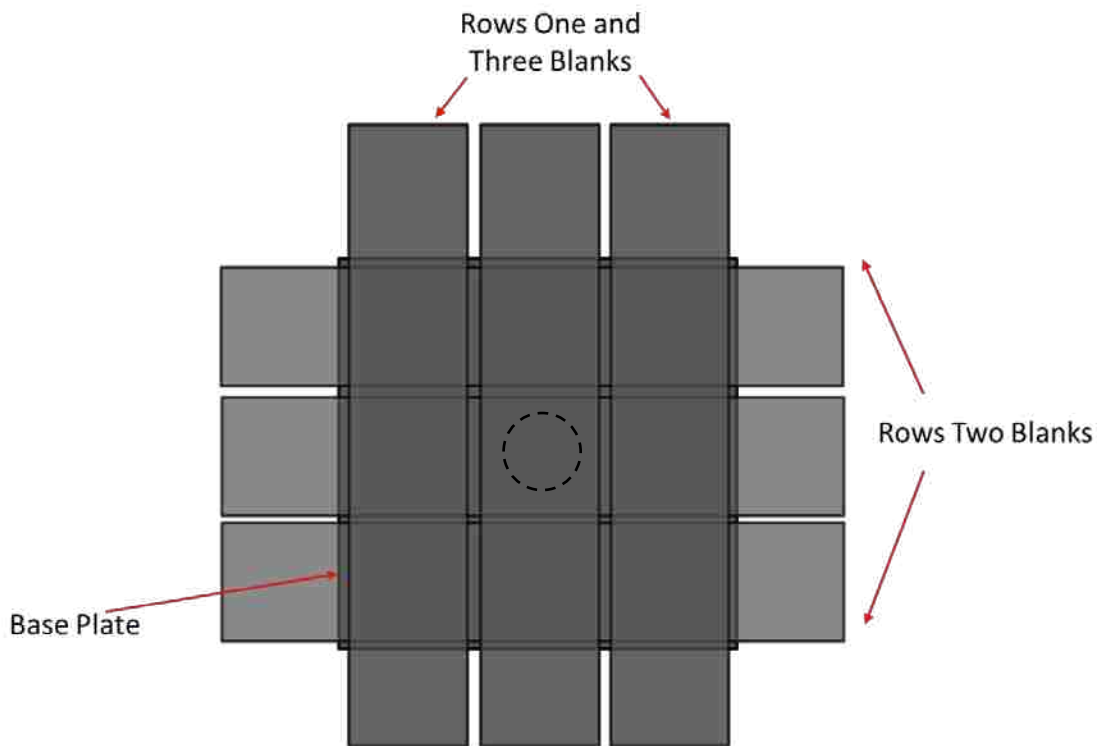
Schematic Plan view of the static loading of the test pile (not to scale).
